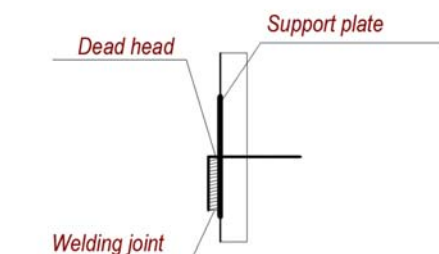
Details of Mounting Tie-rod to the Anchor Plate
